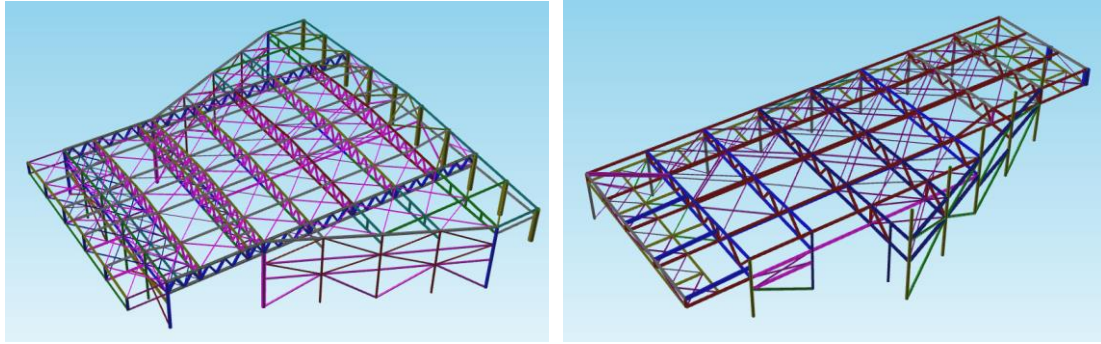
a) Upper Roof Level Trusses; b) Lower Roof Level 6 Trusses
